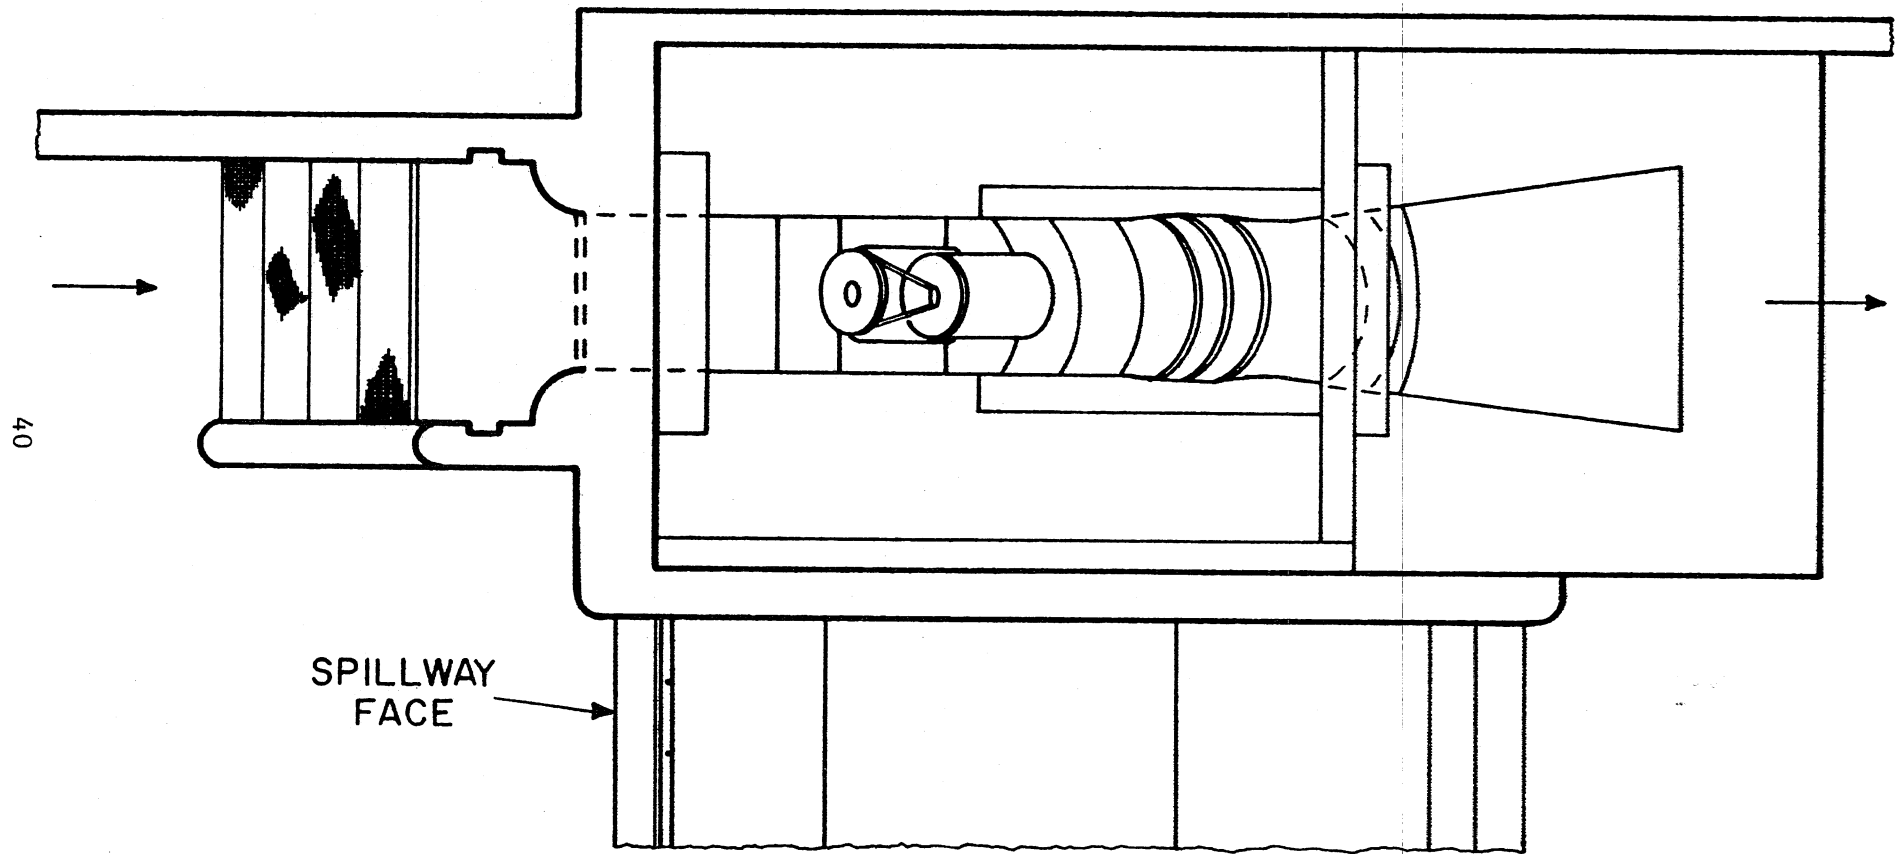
Plan view of typical Mini-Tube installed in the east abutment of the existing dam for Alternatives B, C, and D.
